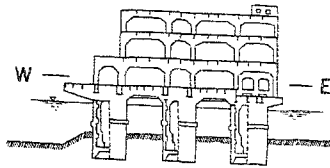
Cross sections of No. 7 pier in Kobe Port.
